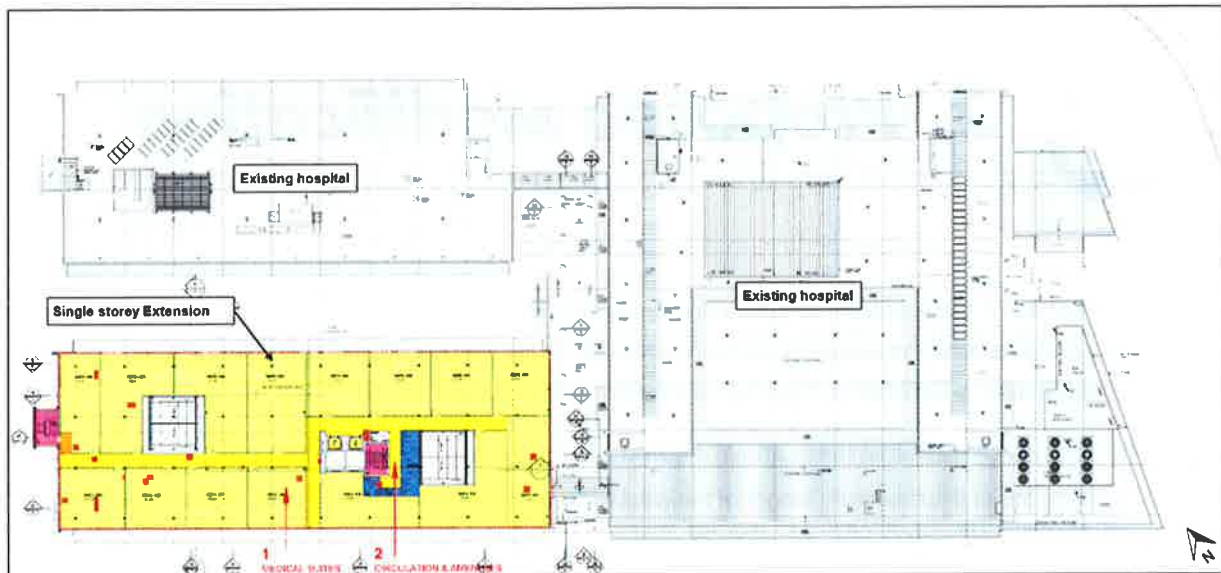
| Location and layout of the single storey extension (Base source: Applicant's modification application)
